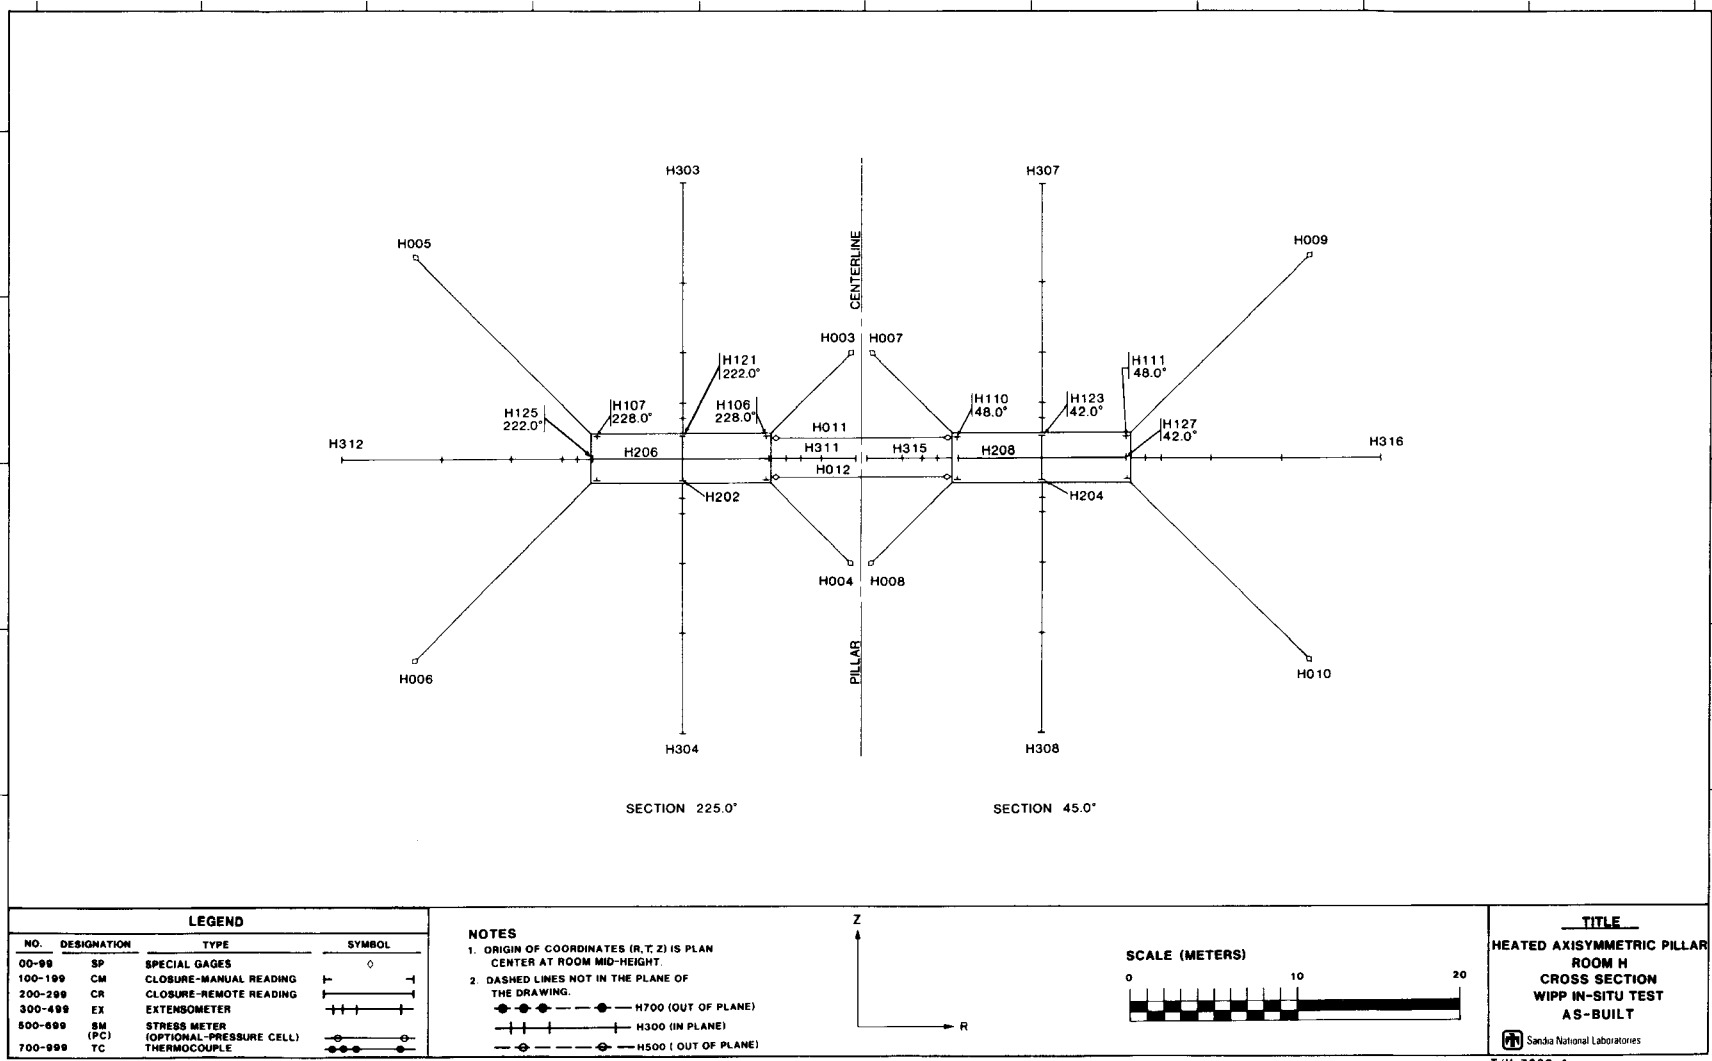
Cross Section of 45° and 225° Instrument Stations
